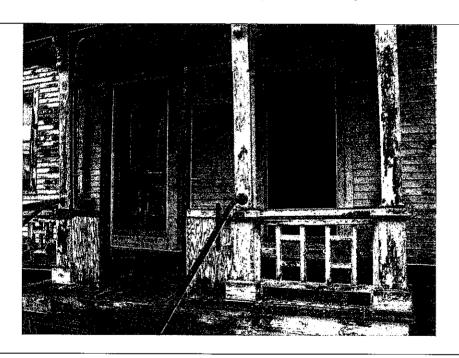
04/27/05 – One-Car garage (Building #13): Exterior of small structure.
